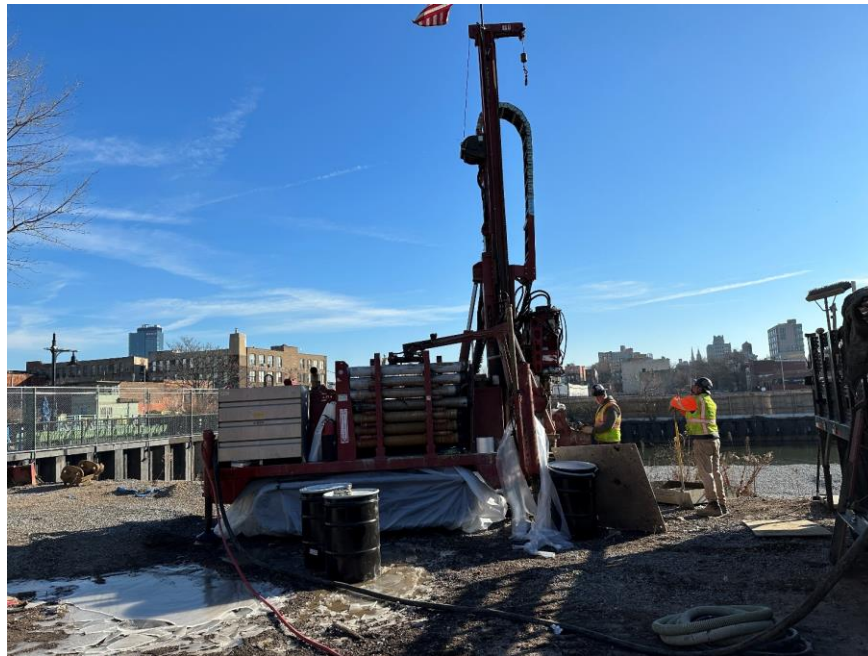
ADT advancing soil boring SSB-02 in the northeastern part of the site (facing north)
